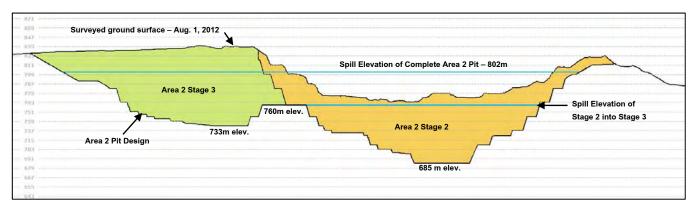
Section through Area 2 Pit Showing Staging and Spill Elevations.
